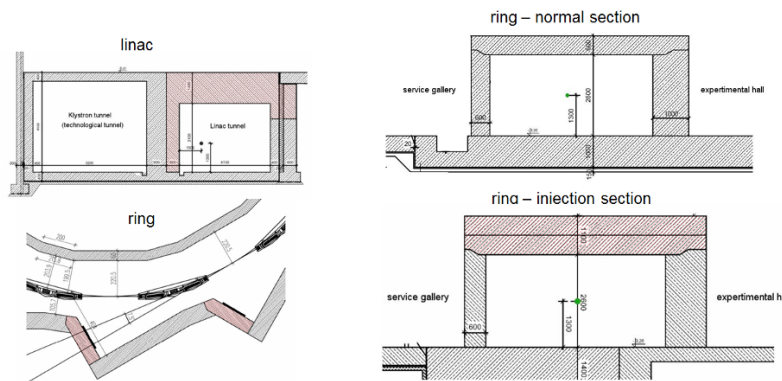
SOLARIS shielding walls. Red colour indicates heavy concrete, grey – ordinary concrete.
